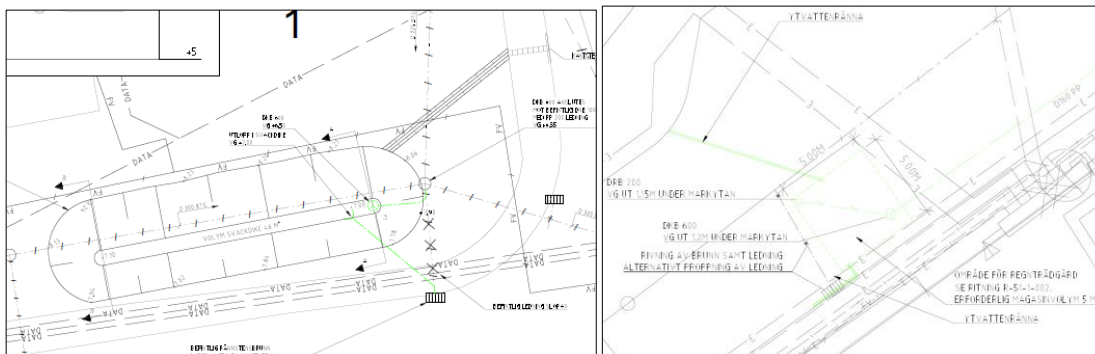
Brädgårdsgatan site (left) and Jazzparken design drawings (right)
